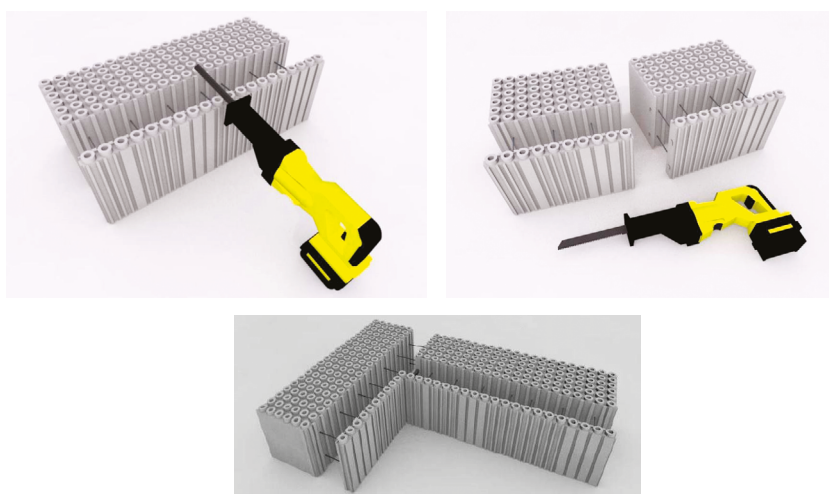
Blocks cutting and installation of block corner pieces (Source: JSC Šilputa, 2021a)
